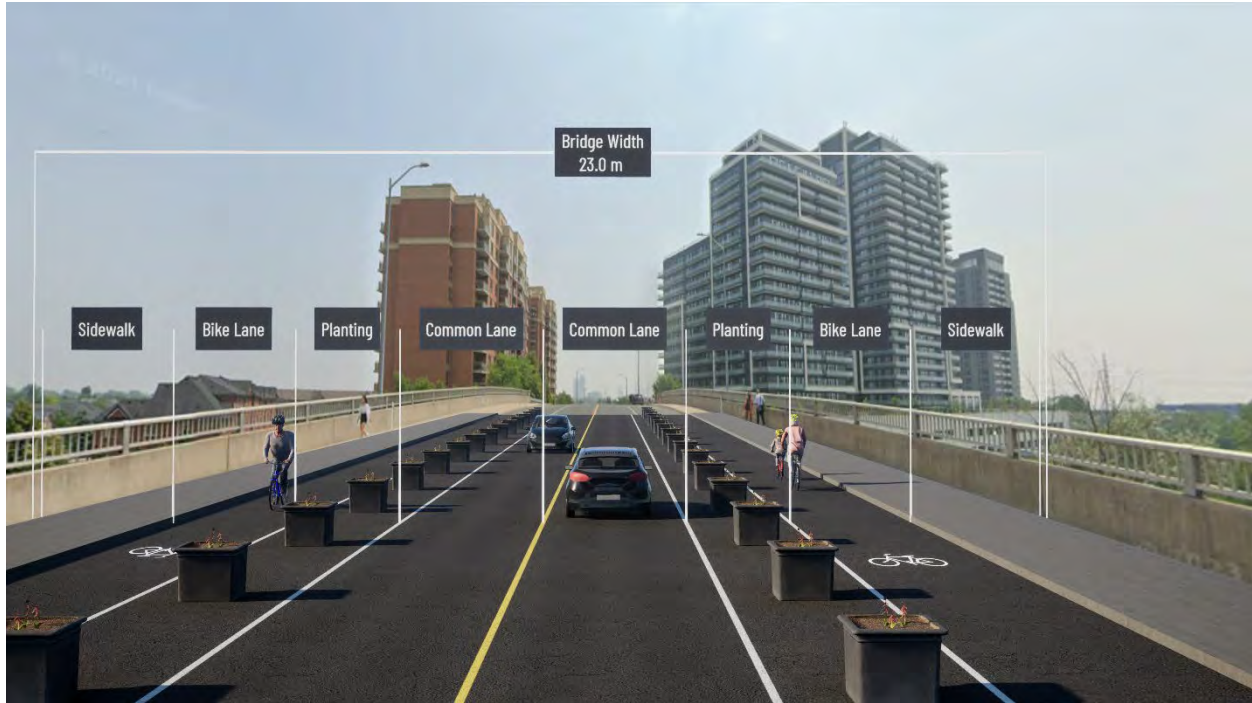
Corridor Option C3 – Protected bike lanes (planters) on Bantry Avenue Bridge between Yonge Street and Maple Road – (Looking east)
